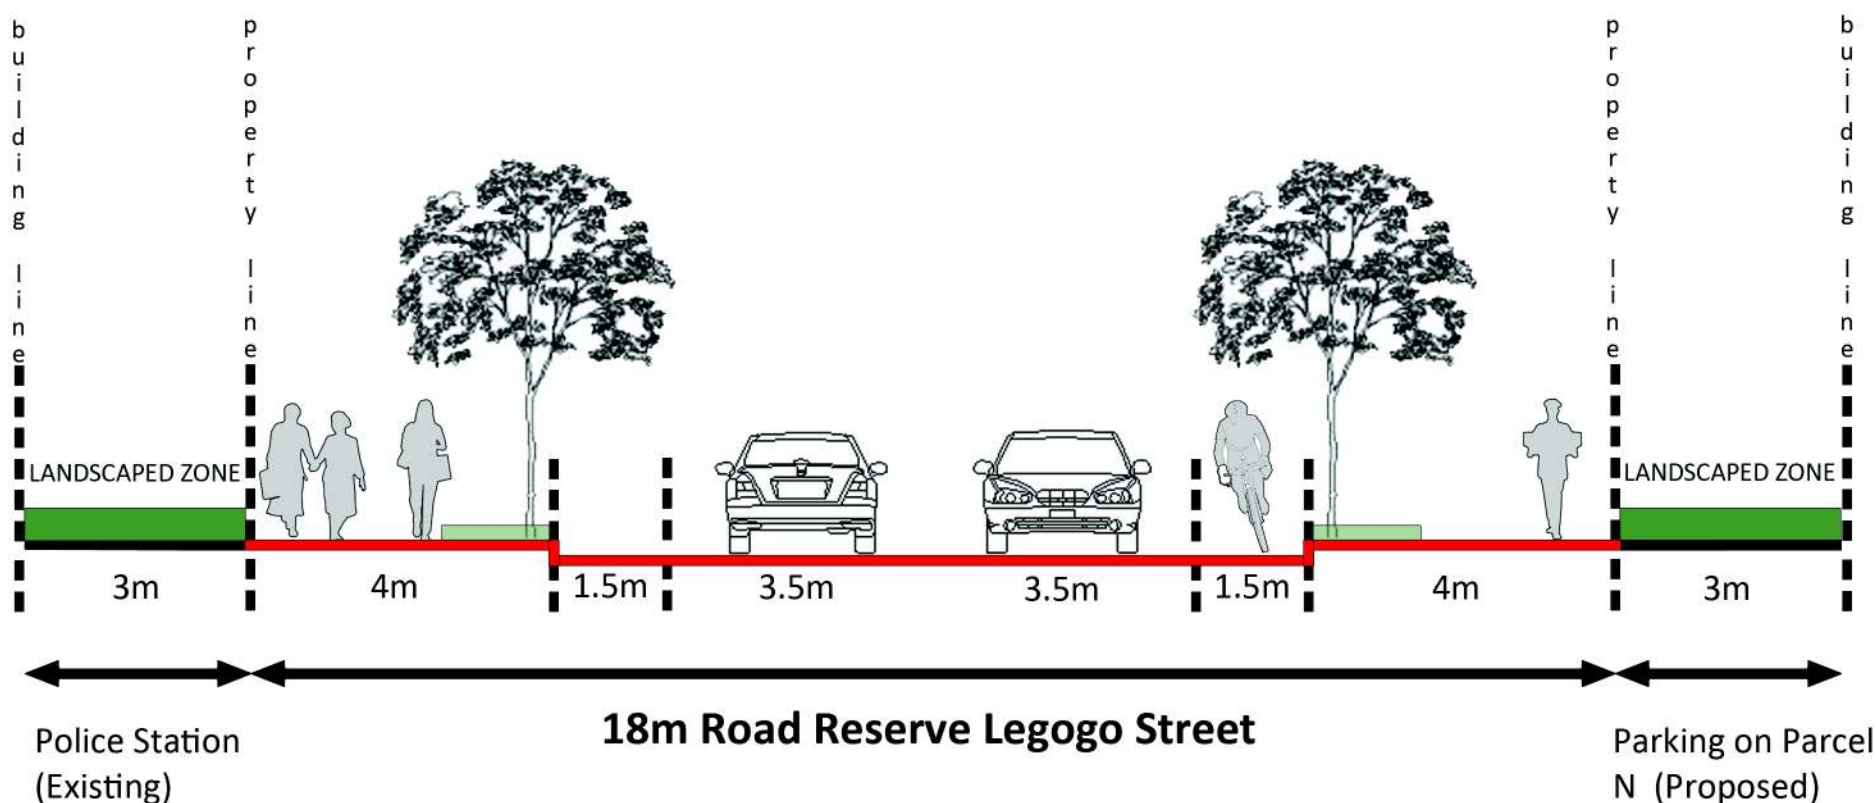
Application of Complete Streets Guidelines to Legogo Street
